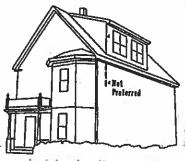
Setting the front wall of a dormer flush with the main wall underneath is not recommended. See Fig. 6 for the preferred 1 ft. 6 in. zetback.
